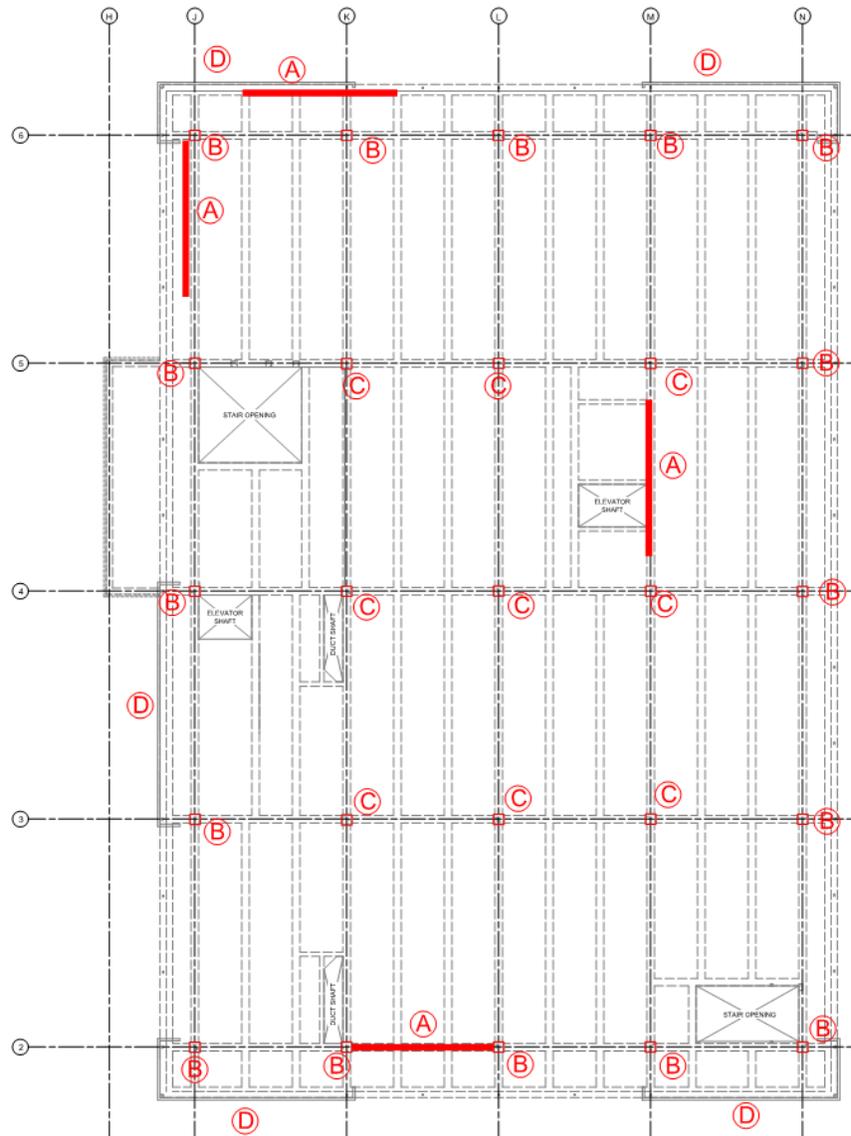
Typical floor plan at Courthouse indicating: A=proposed locations of retrofitted shear walls; B=exterior concrete columns; C=interior concrete columns; D=exterior precast concrete façade panels
